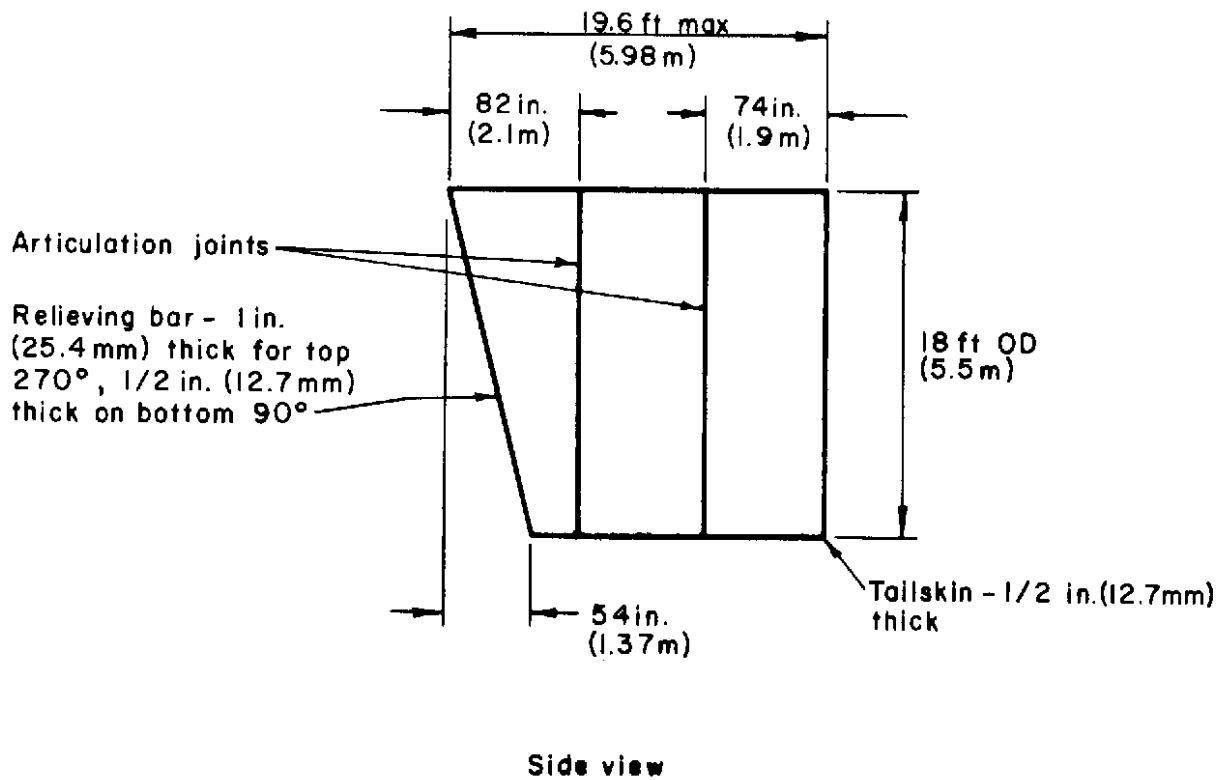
F ROUTE TUNNEL SHIELD DIMENSIONS
